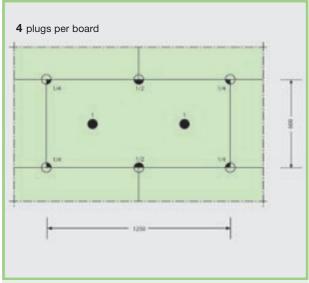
Alignment and number of wall plugs (four per board) for a subsequent base installation of Styrodur® C boards (units in mm).
